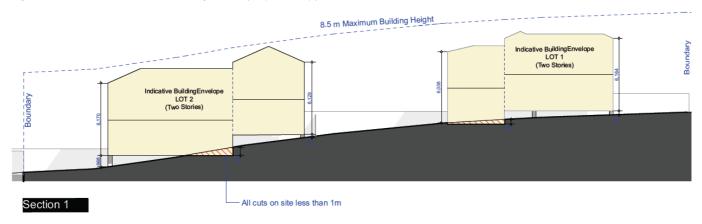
Extract of Indicative Building Envelope (DA-005) plan (2)
